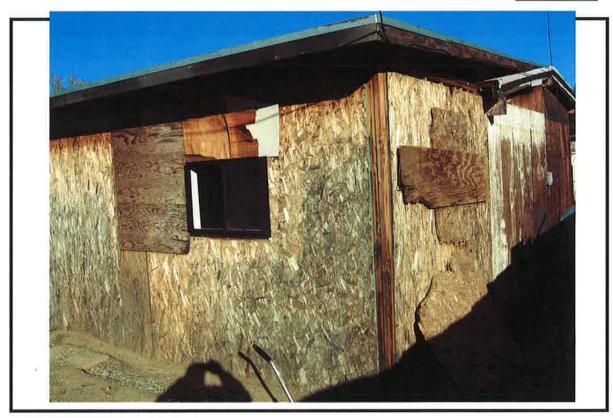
DATE: 01/08/08 TAKEN BY: A Green#69 NOTES: plywood no insulation
